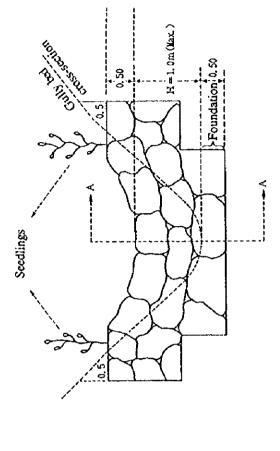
Gully Control with Bioengineering Work and Simple Structural Work
